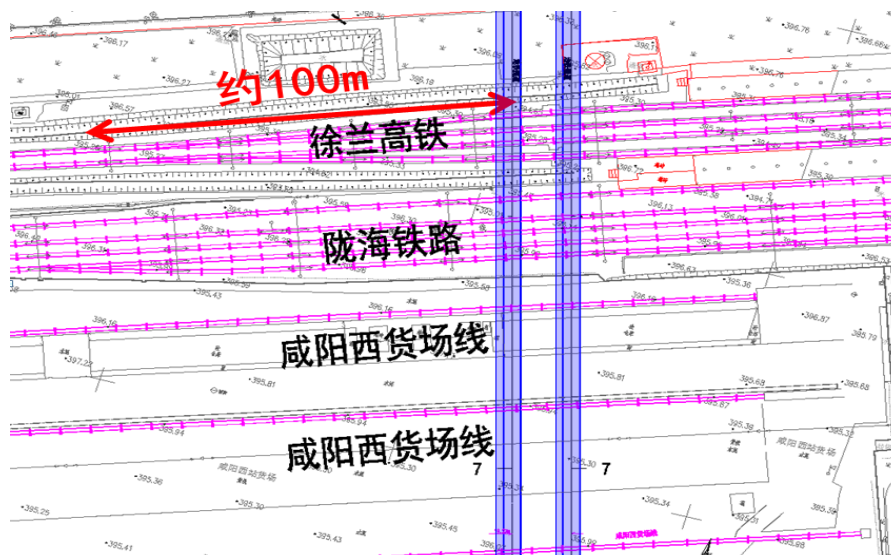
Diagram of plane location relationship between subway section tunnel and railway
